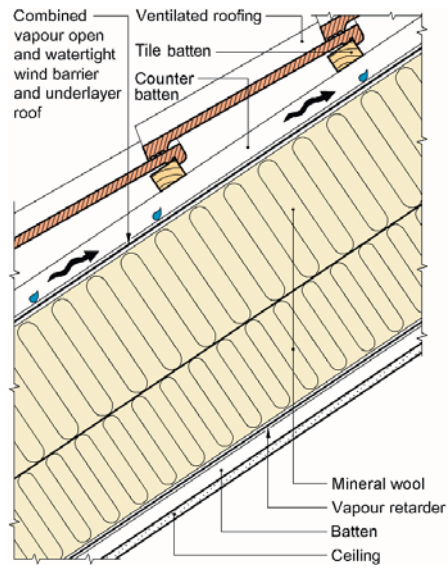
Pitched wooden roof Type B with combined underlayer roof and wind barrier.
